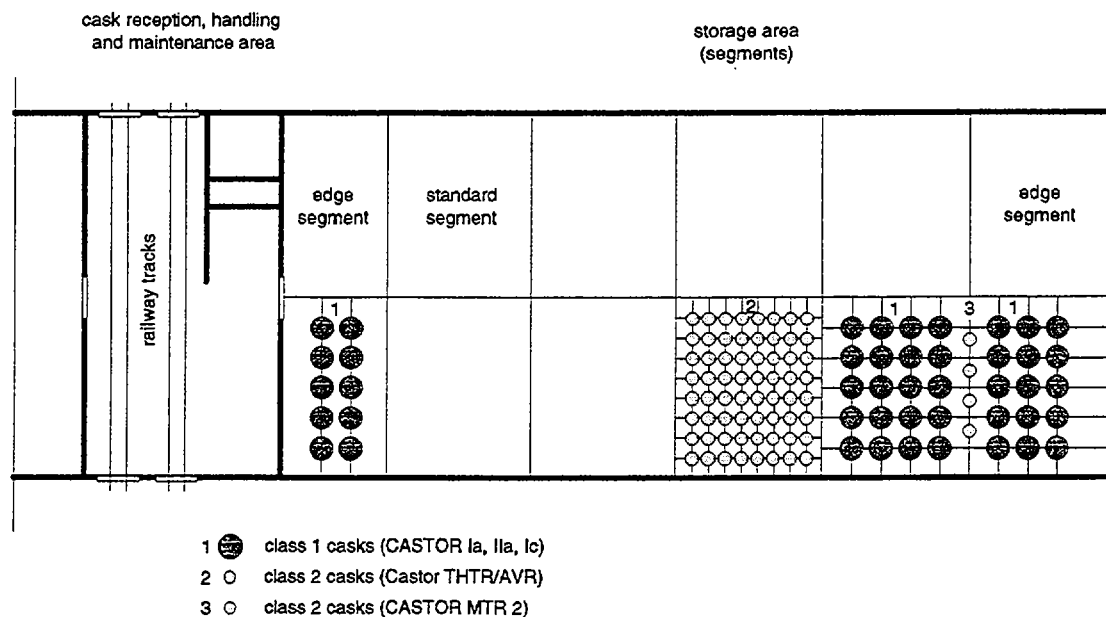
Simplified ground plan of one storage area of the Ahaus interim storage hall
